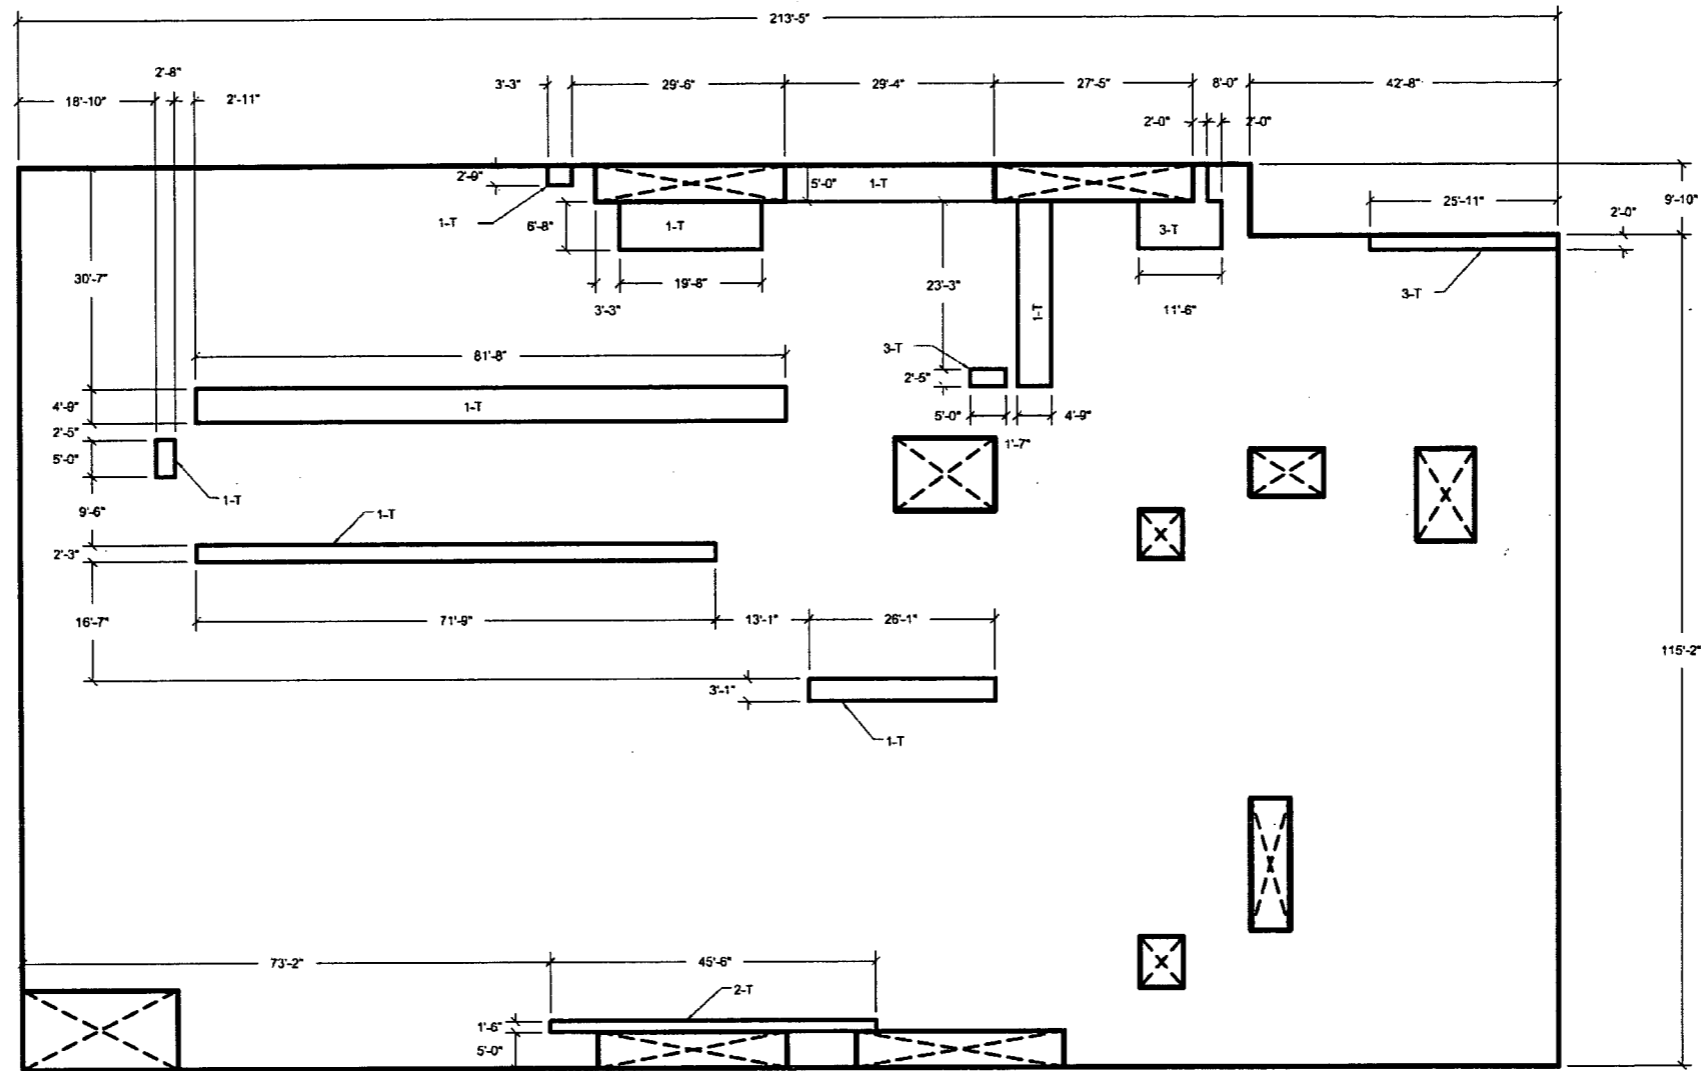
H, 3-34: ELEVATION 35 LOOKING DOWN
